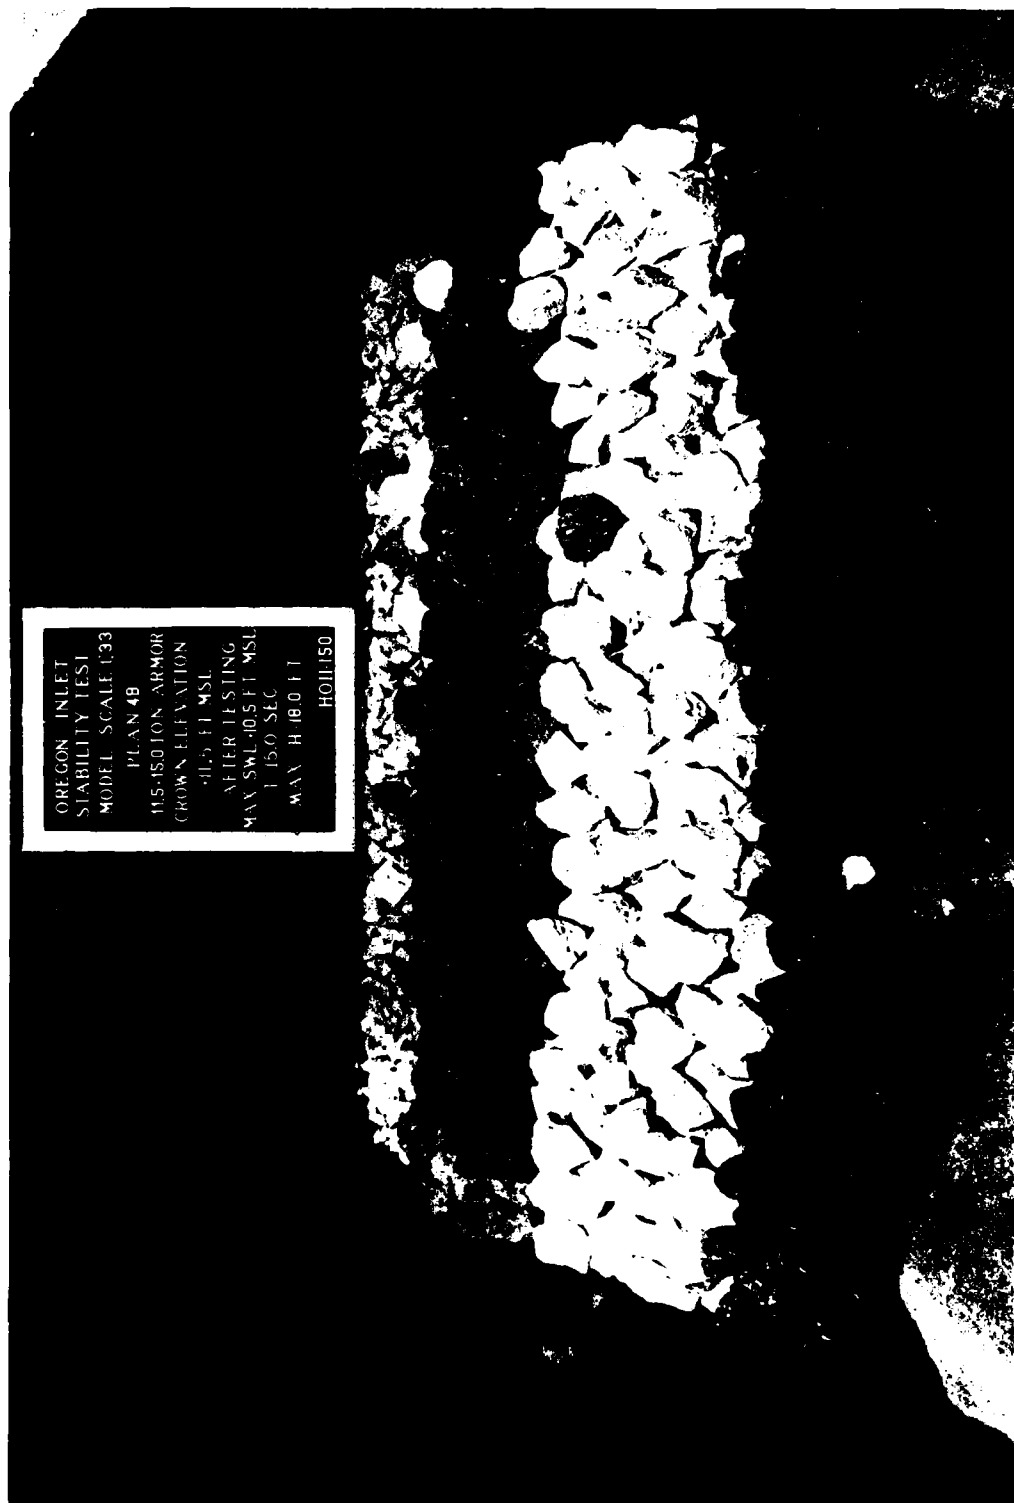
Sea-side view of Plan 4B after testing step 11 of the +10.5 ft NGVD hydrograph
